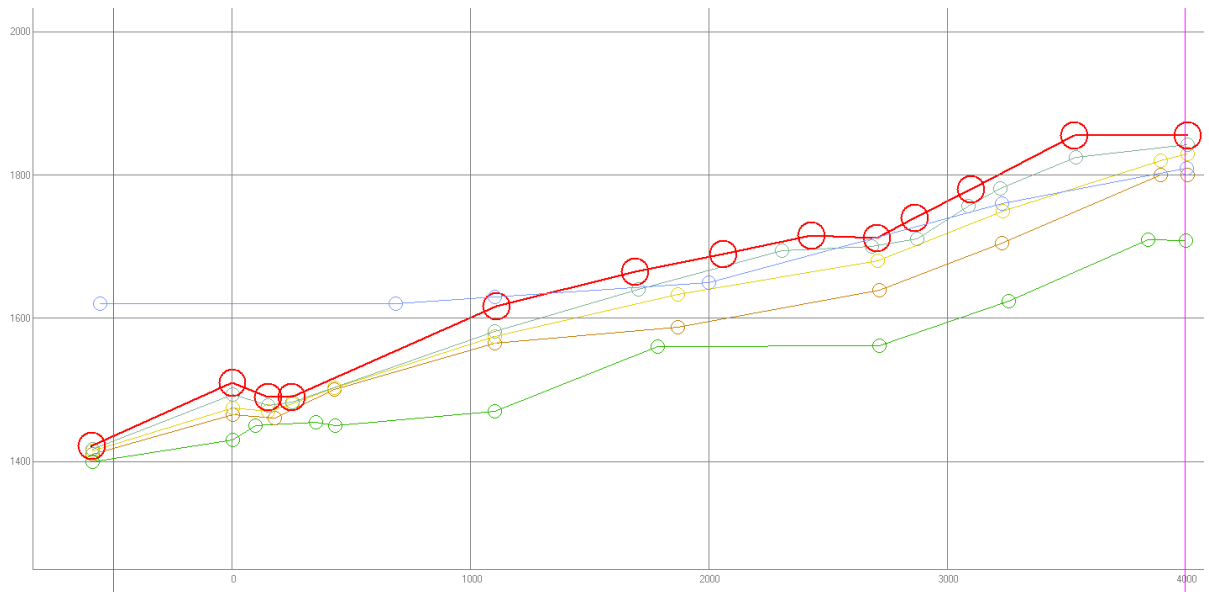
Stratigraphic profile of Section 7 in CLARA/W at reservoir elevation of 1620 ft
